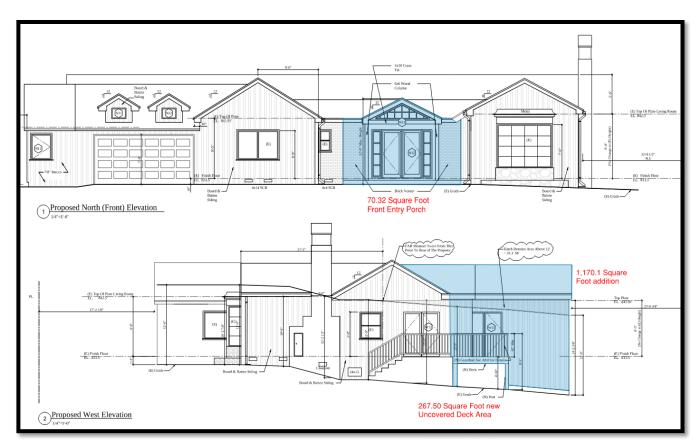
Elevation plan of the proposed development with additions shown in blue.
